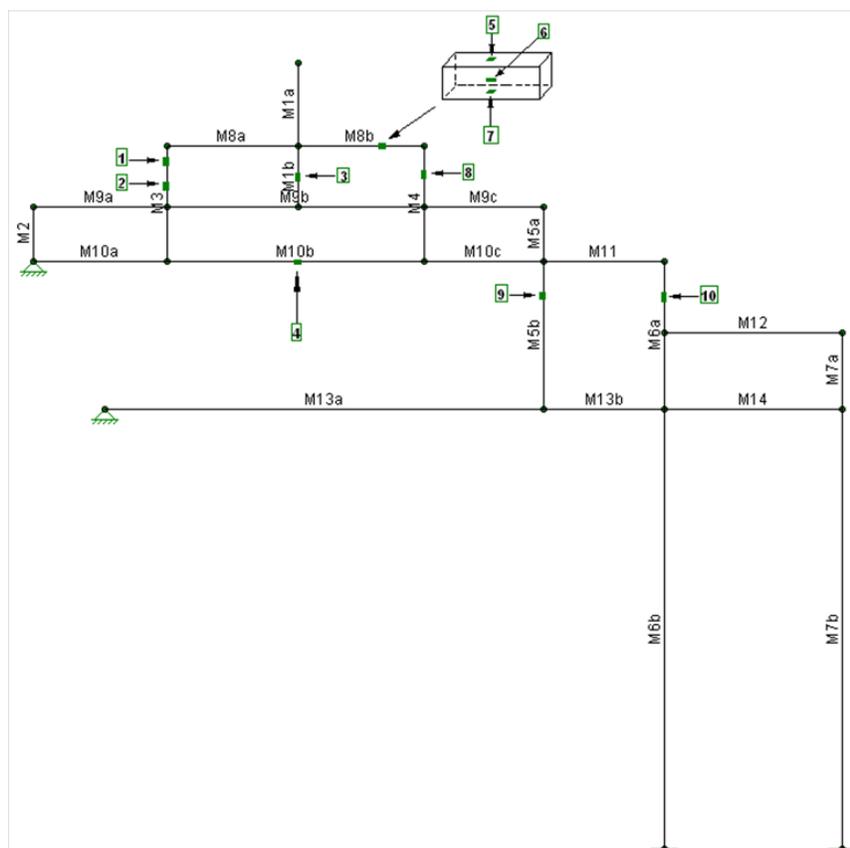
Tulou Roof Truss Member Definition and Strain Gage Locations
